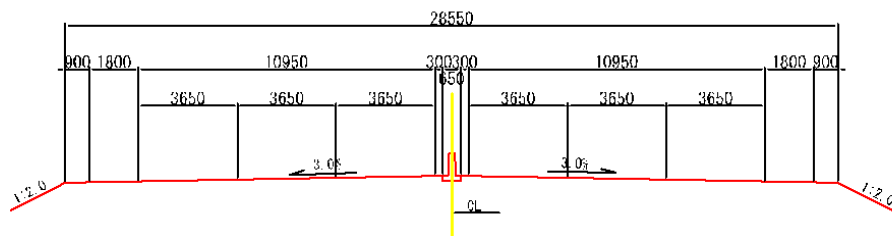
Typical Cross Section of New and Existing Meghna Bridge
